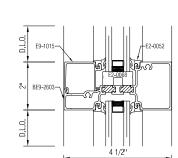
DETAIL: VERTICAL MULLION SCALE: 3"=1'-0"
